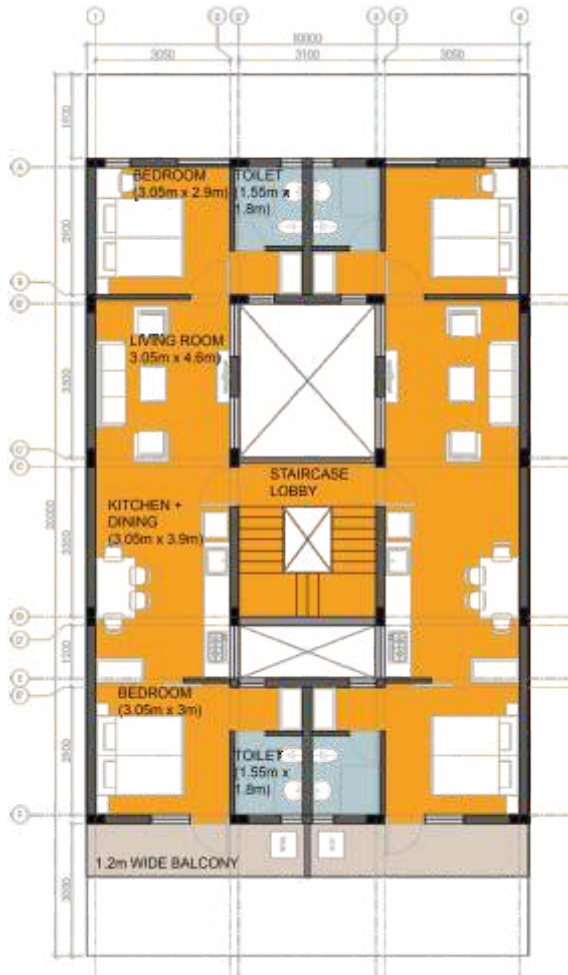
Typical ground floor plan of Type 7 dwelling unit
